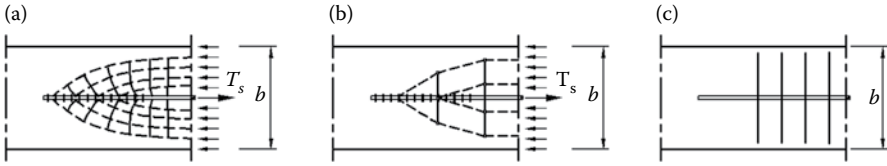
Symmetrical anchorage of a reinforcing bar in a concrete body: (a) stress trajectories, (b) plane *STM*, and (c) associated transverse reinforcement. (From Schlaich, J., and Schäfer K., *IABSE Workshop*, New Delhi, 1993.)
